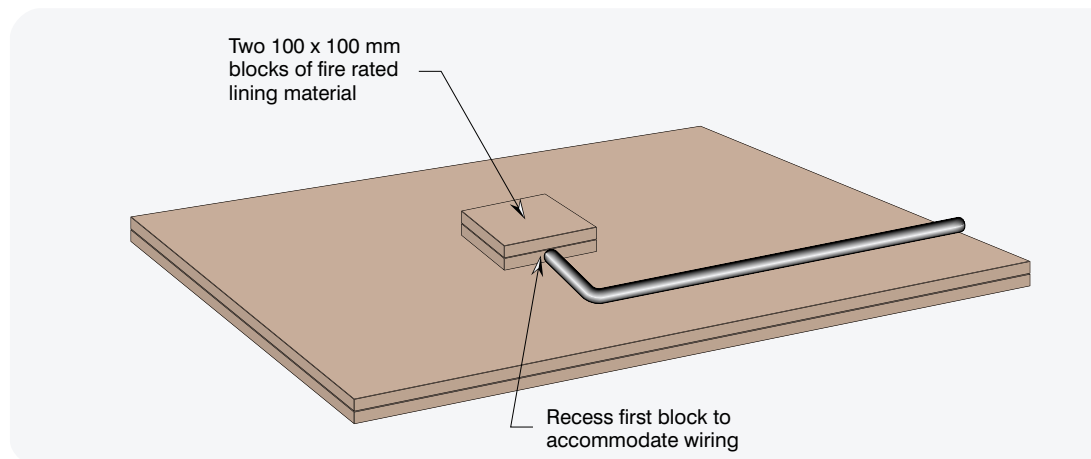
Electrical service penetration in fire- and sound-rated wall and floor/ceiling.
